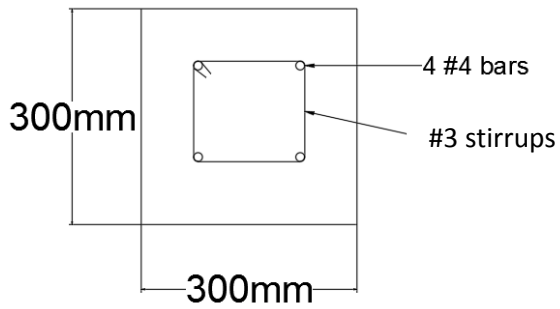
Beam Cross-sections for Y-axis 4F-ROOF
